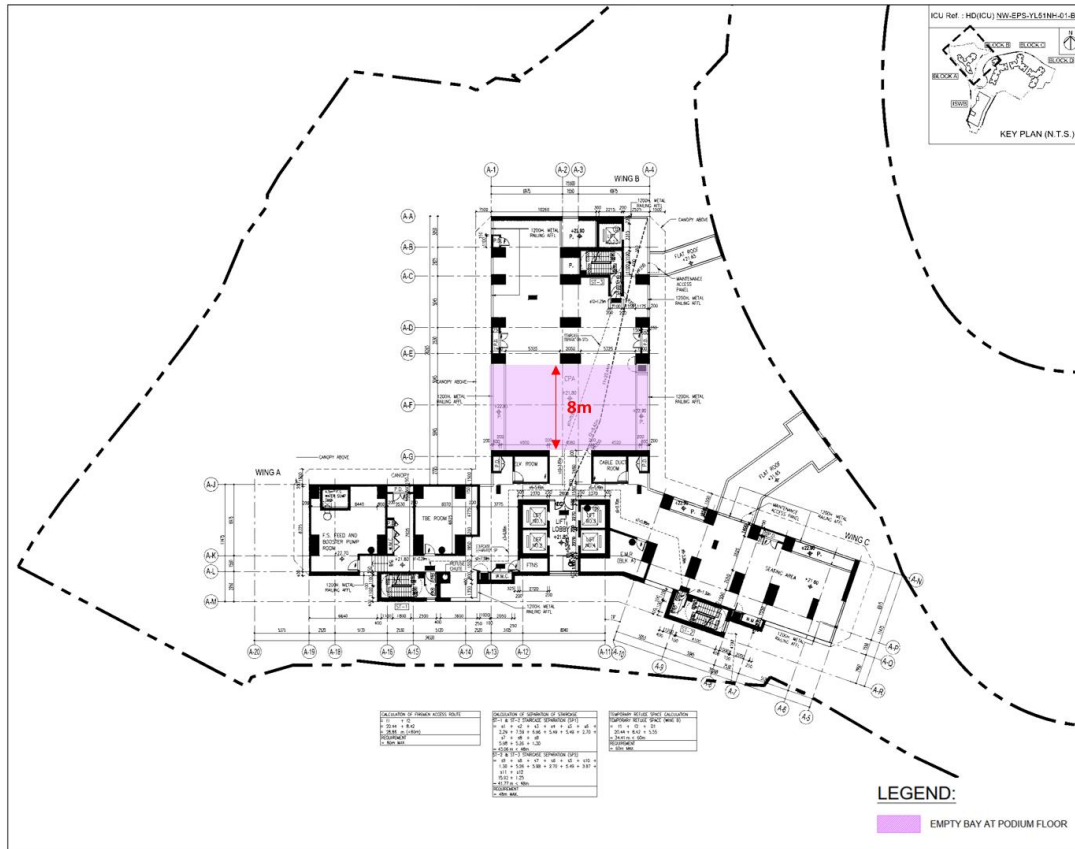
Preliminary Layout of Proposed Scheme at Site B (P1/F)
